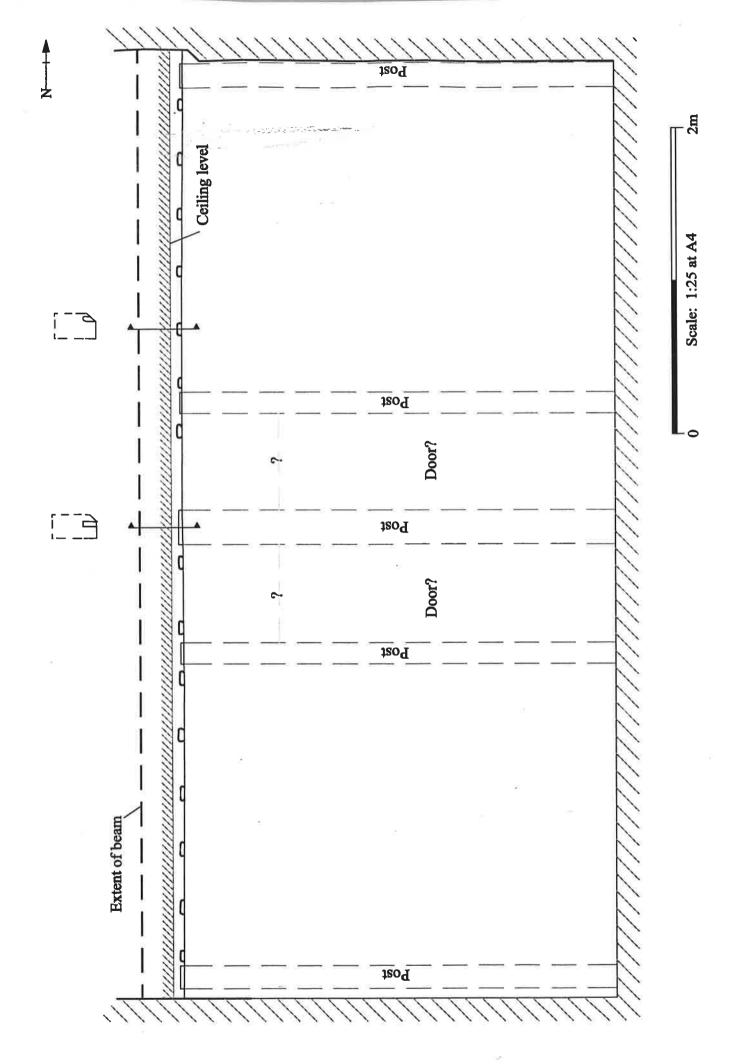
Ceiling beam with post and stud motices, reconstruction showing possible position of former doors in partition wall
